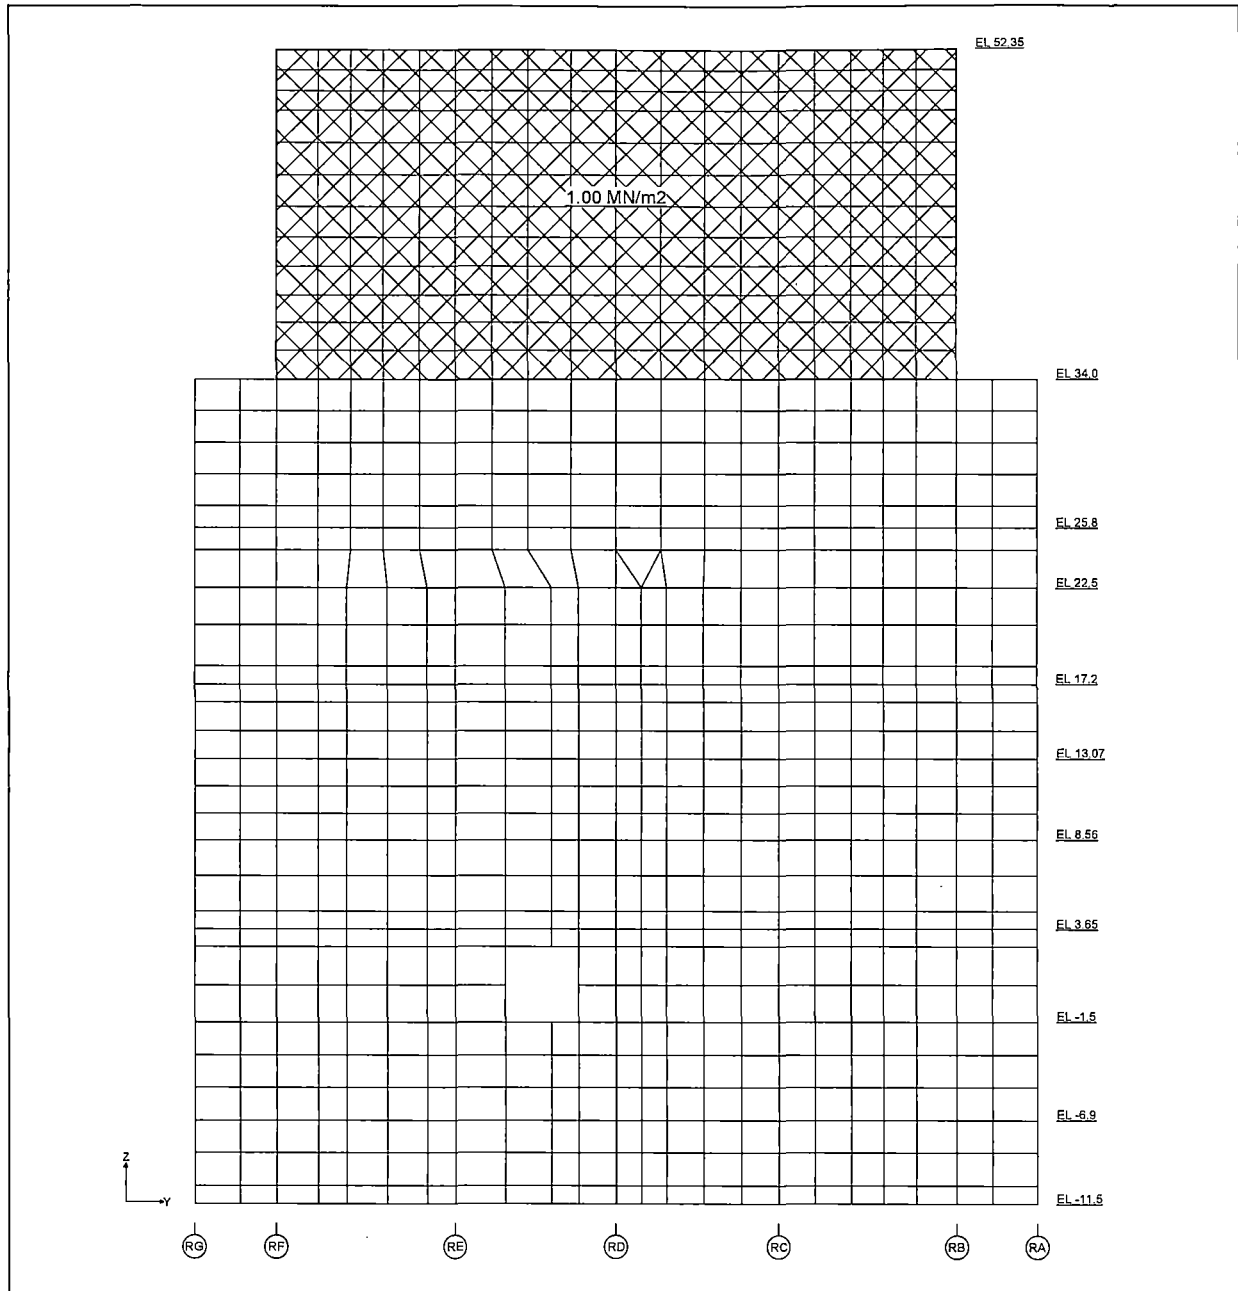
HELB Pressure Load (for RB General Rooms: R7 Wall)
